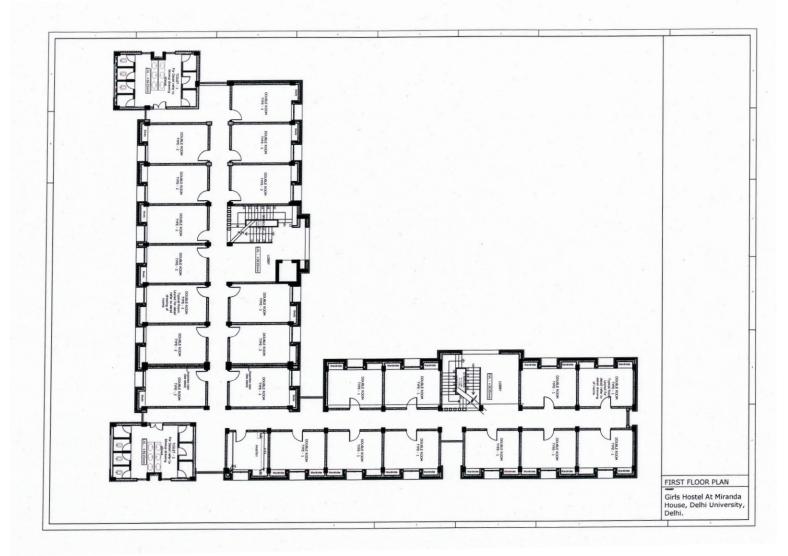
(k): Layout plan of MH Hostel New Block: First Floor
